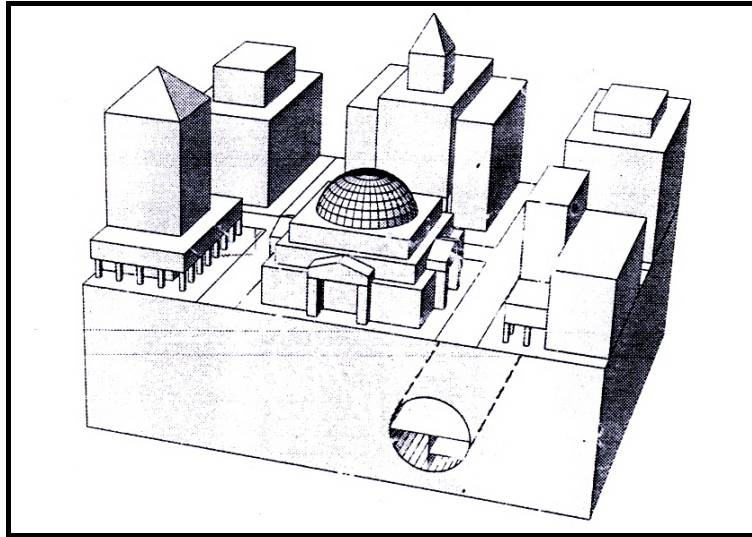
Underground Usage by Boring (Source: Sterling, 1993).
